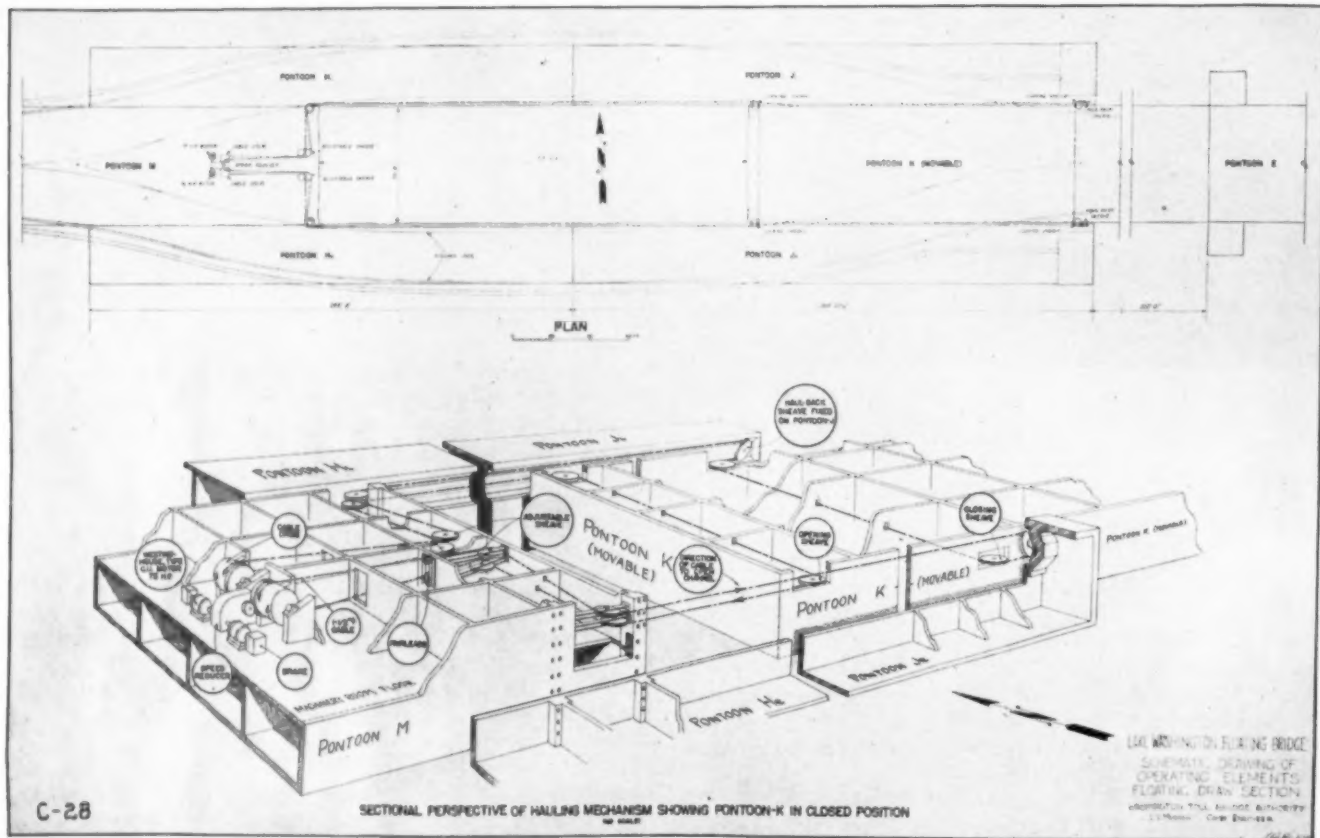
Section Schematic Perspective of Operating Mechanism Showing Movable Pontoon in Closed Position
